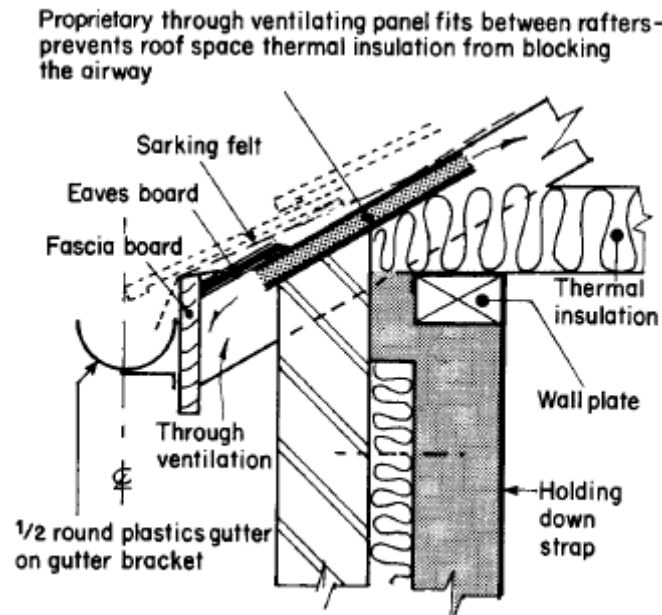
Proprietary roof ventilator used in conjunction with open eaves
